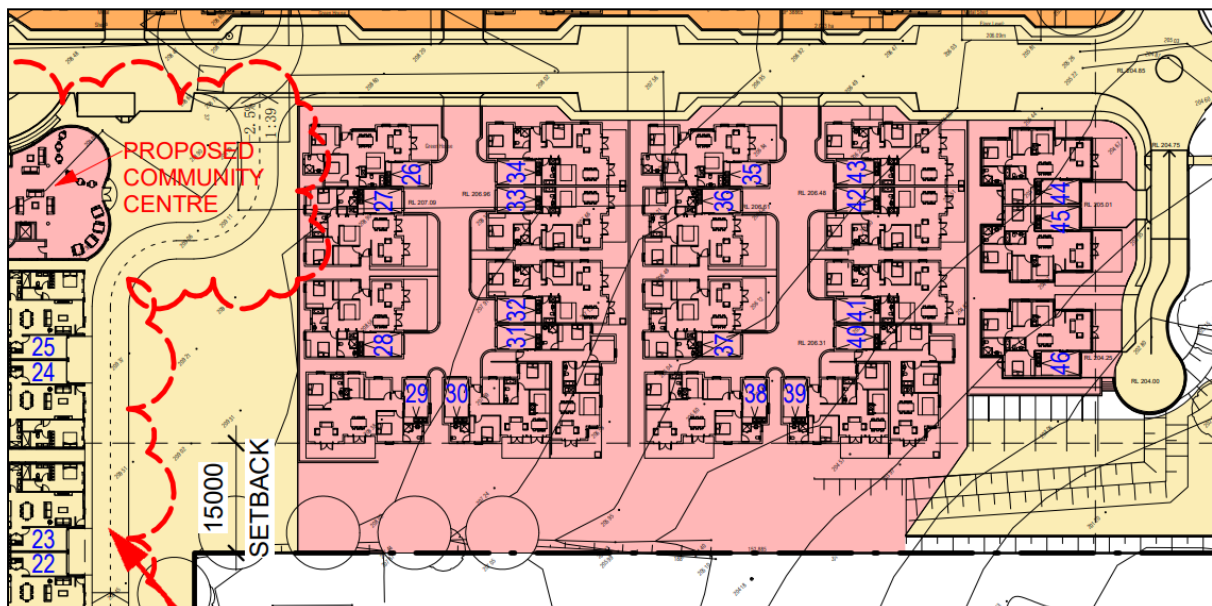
Currently Approved Stage 2 layout shown in Pink.
